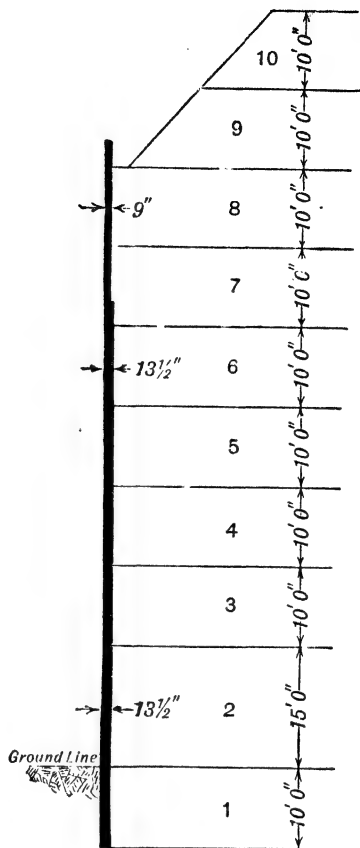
Panels of Brickwork in a Steel Skeleton Building of the Warehouse Class.
